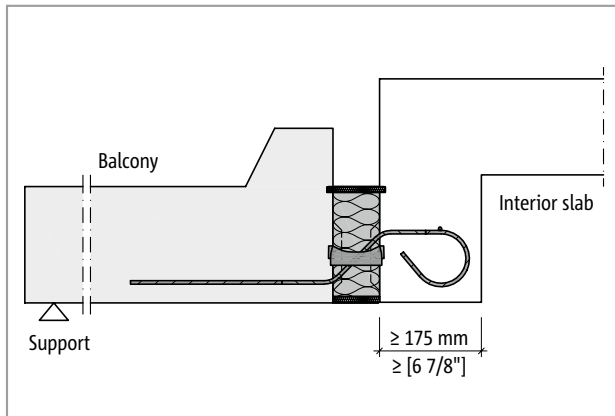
Schöck Isokorb® T Type CQ: Connection for pre-cast balcony slab (e.g. T Type CQ-V1 to CQ-V5)
